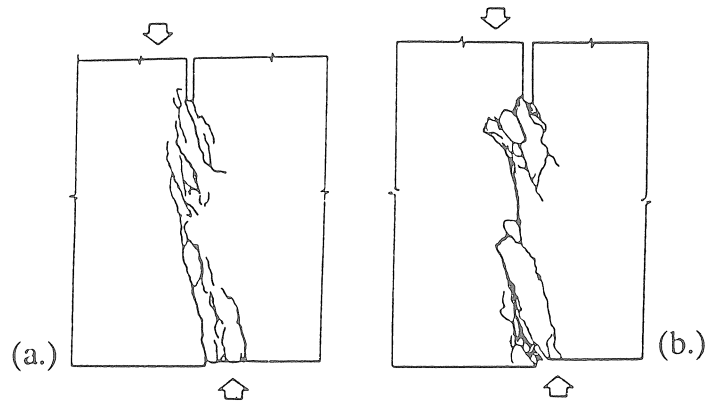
Shear fracture in (a) polypropylene fibre reinforced concrete (0.10%); and (b) in steel fibre reinforced concrete (2%), after [35].
